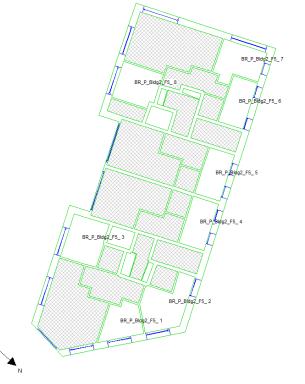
Level 5 bedrooms in Building 2 (larger plan in Appendix A)
